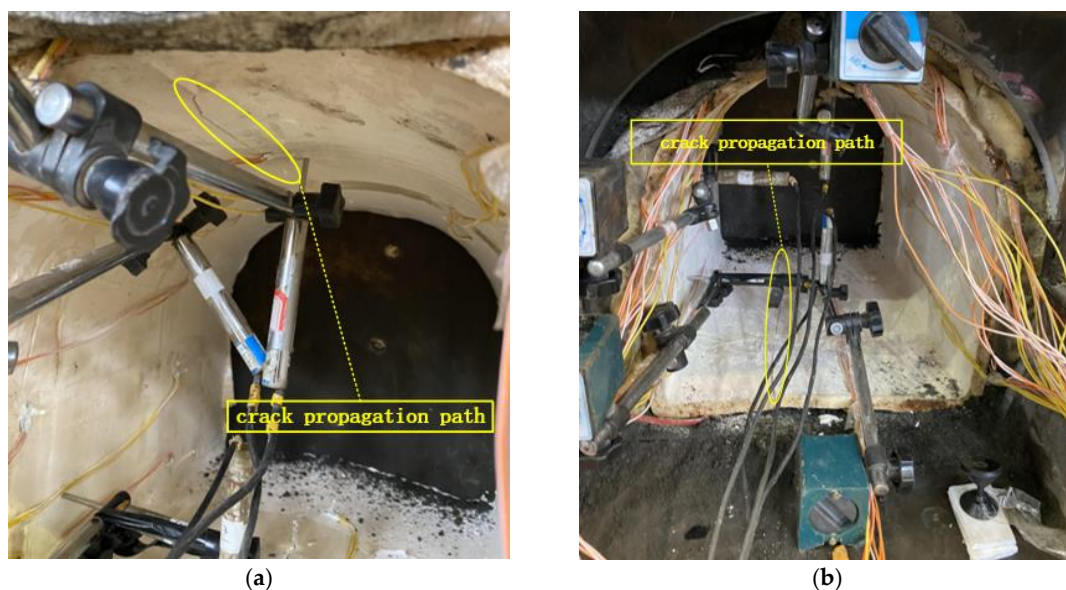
Crack propagation of single-layer linings. (a) Crack propagation path on the arch crown of the SFRC single-layer lining model, (b) Crack propagation path on the floor of the plain concrete single-layer lining model.
